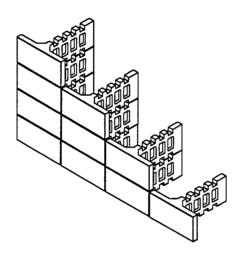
T-WALLTM RETAINING WALL (A patented system)
